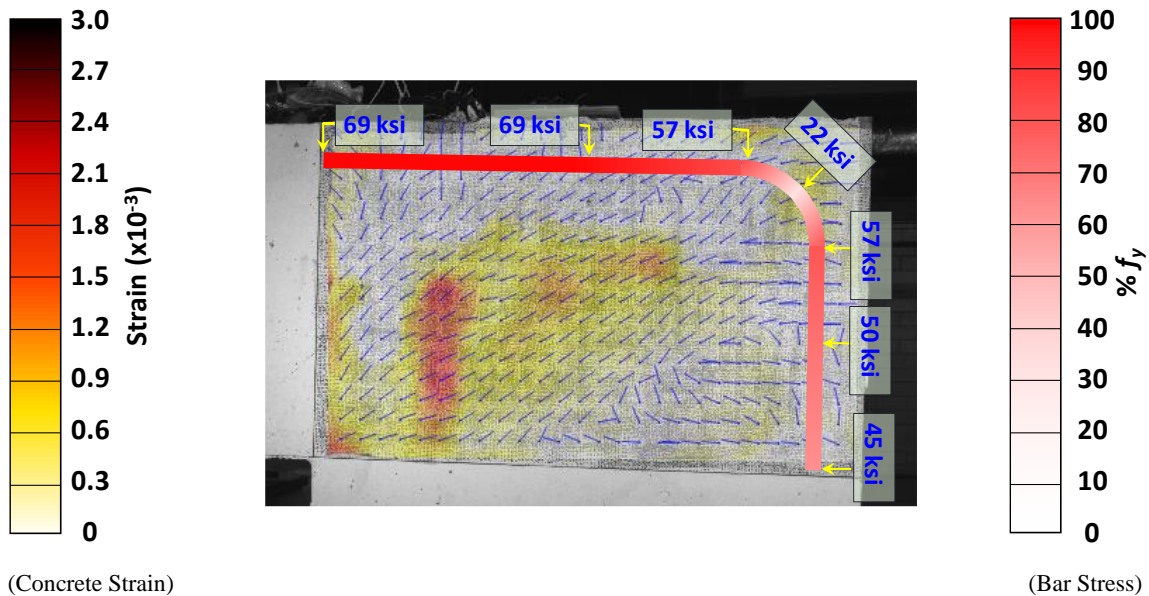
Bar stress distribution and concrete strain in the joint of Specimen C-R6-60
